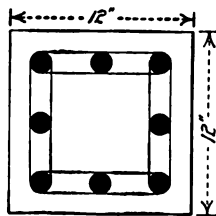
Section of Pile for Quay Wall at Southampton, England.
